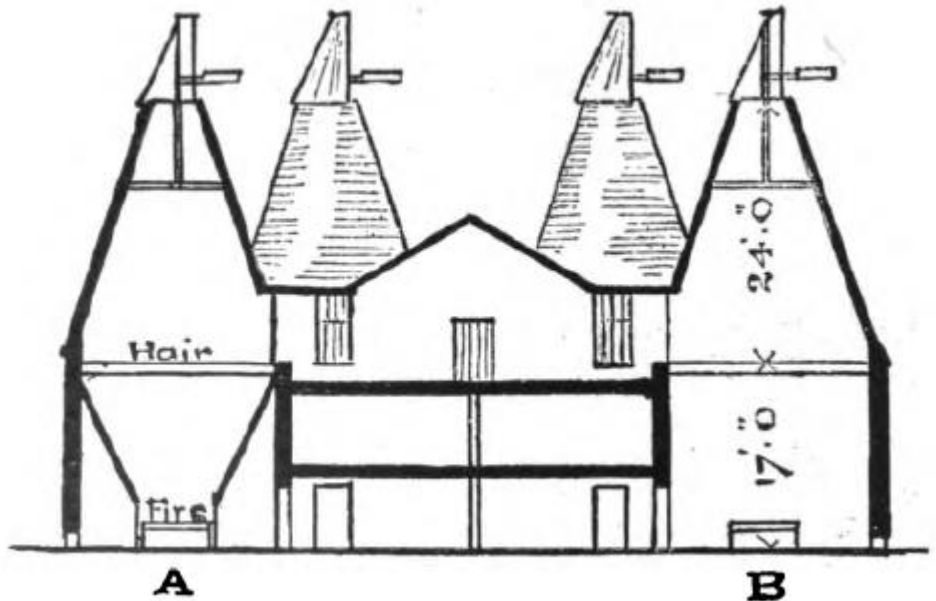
SECTION OF GROUP OF KILNS AND COOLING ROOM.
